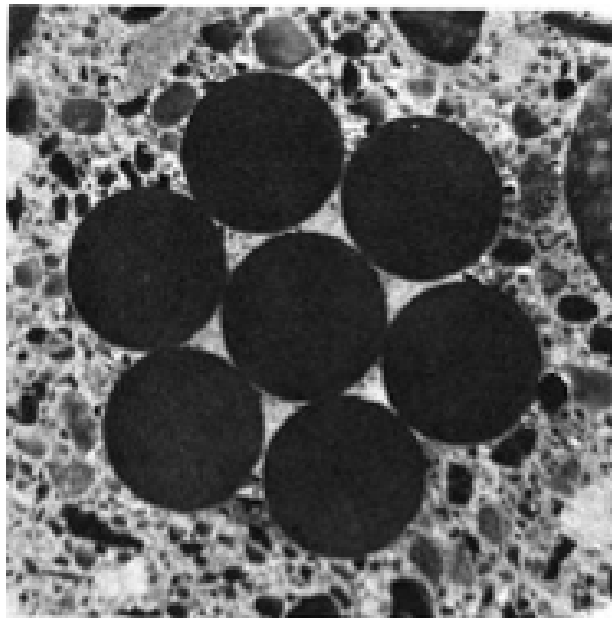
Cross-section of a strand cast in concrete (Stocker et al., 1970)
